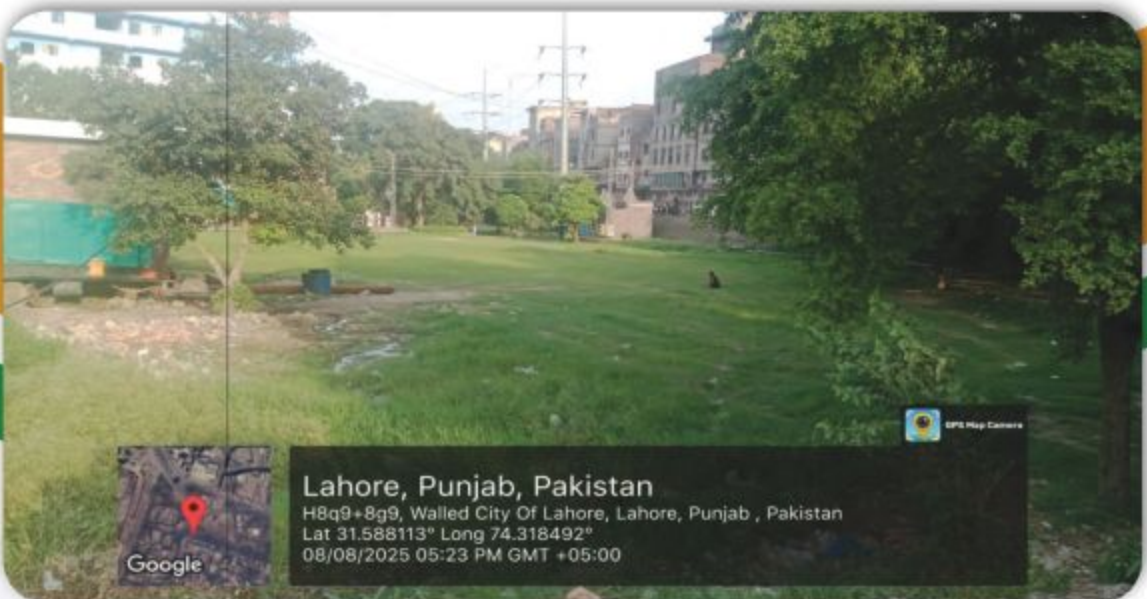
Green area on the Roof of the Stormwater Storage Tank at Sheranwala Gate, Lahore
